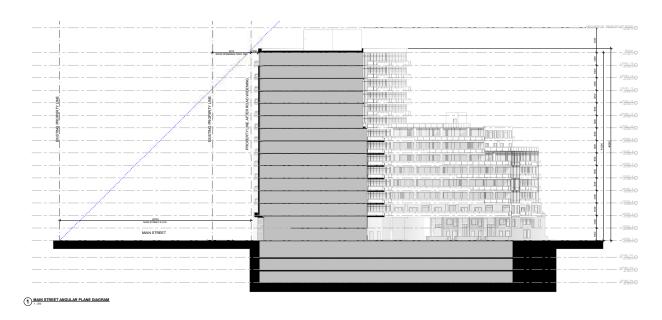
Main Street Angular Plane (Source: srm Architects Inc.)
